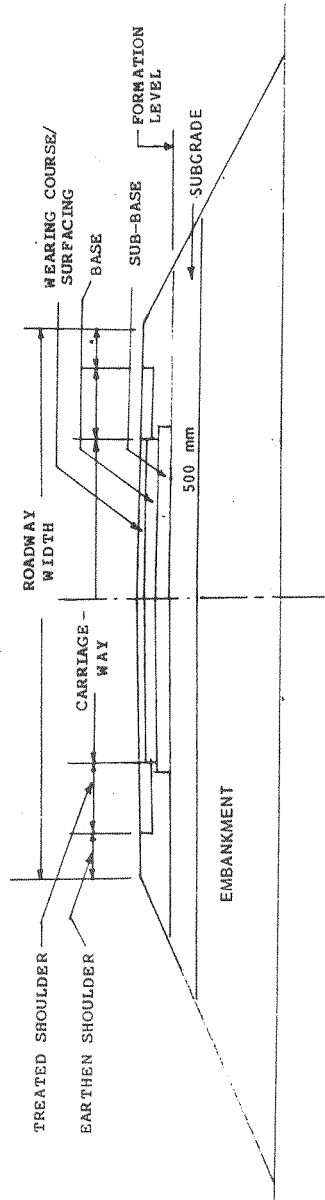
Terms used in the specifications to describe road cross-section elements with a flexible pavement
